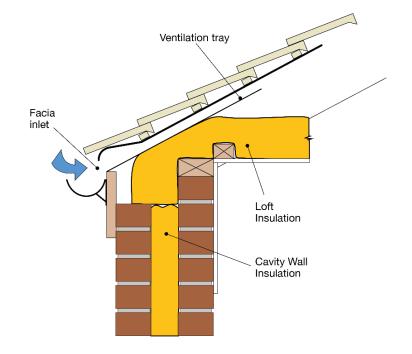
Standard Eaves Detail on a cavity wall construction without external wall insulation (EWI)
